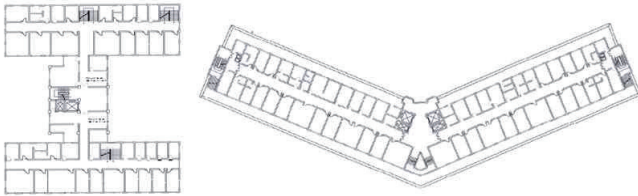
Typical Floor Plan of Hosp-3 and Hosp-6 West Branch
